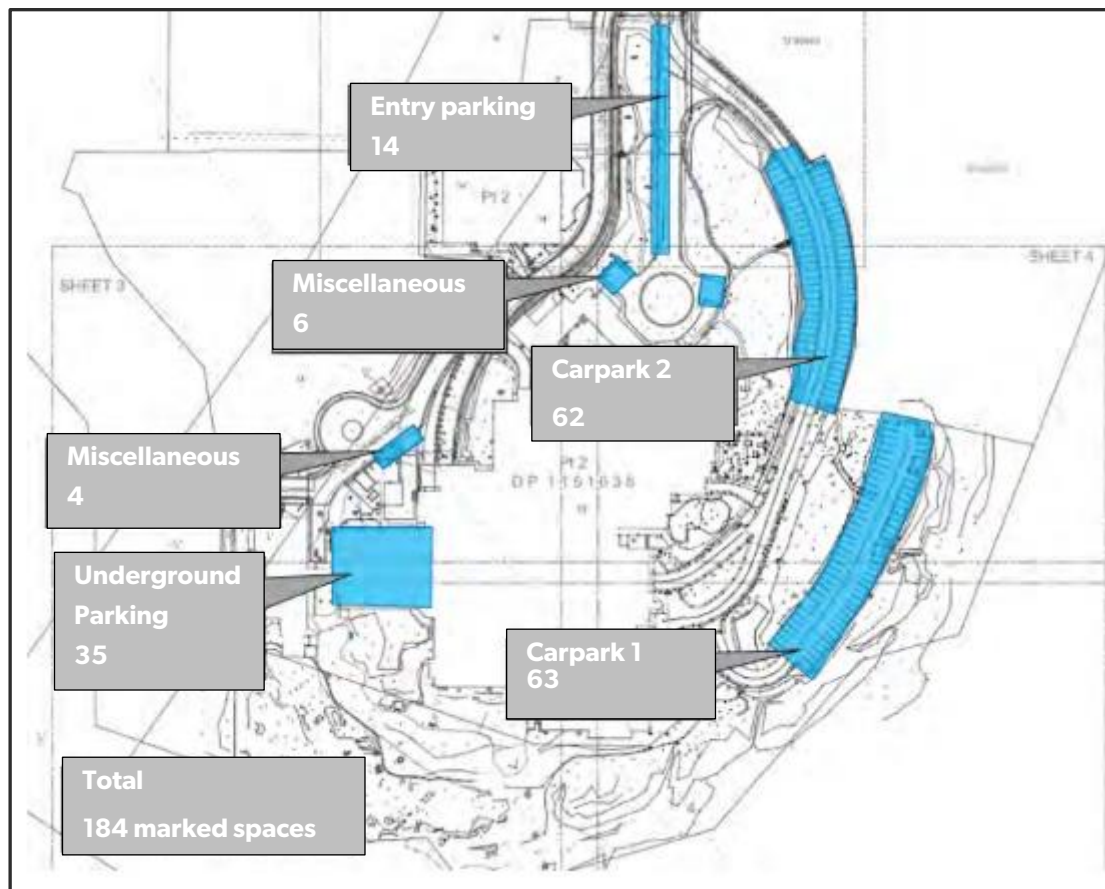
| Existing car-parking (Source: Applicant's EIS)
